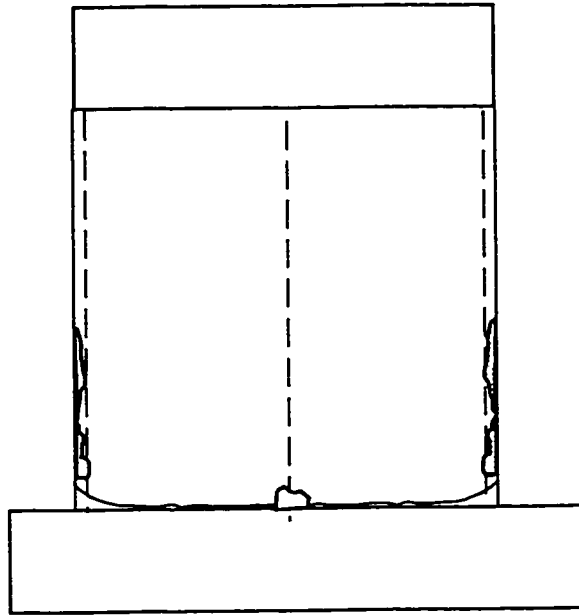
Schematic of cracking in Wall 11 (rocking path)
